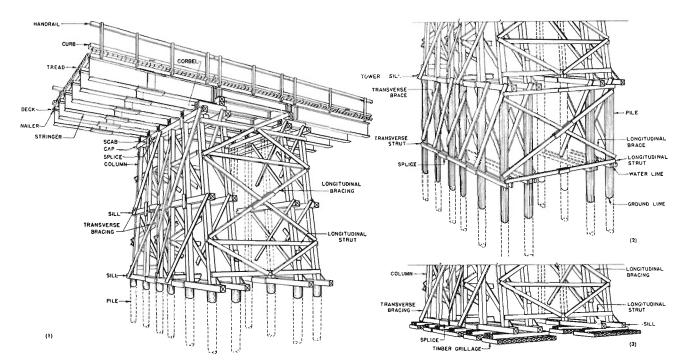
Highway bridge, class 50, double-lane, steel stringer spans, framed timber tower:
